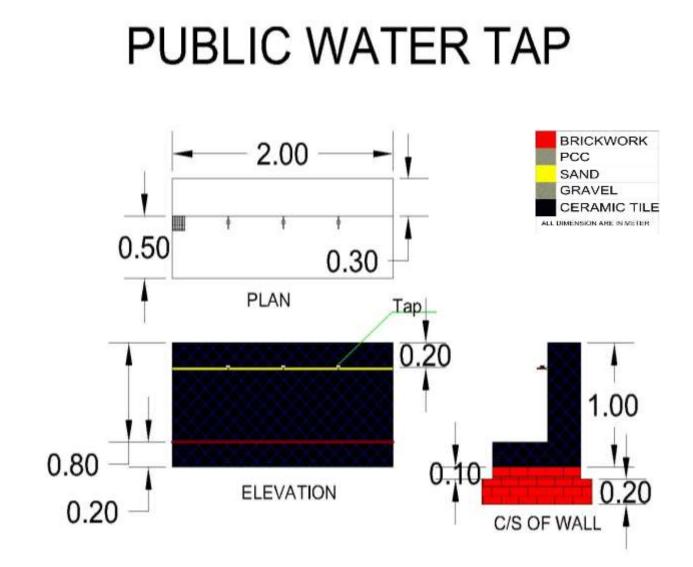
Plan, Elevation & Cross Section of Public Tap Water
